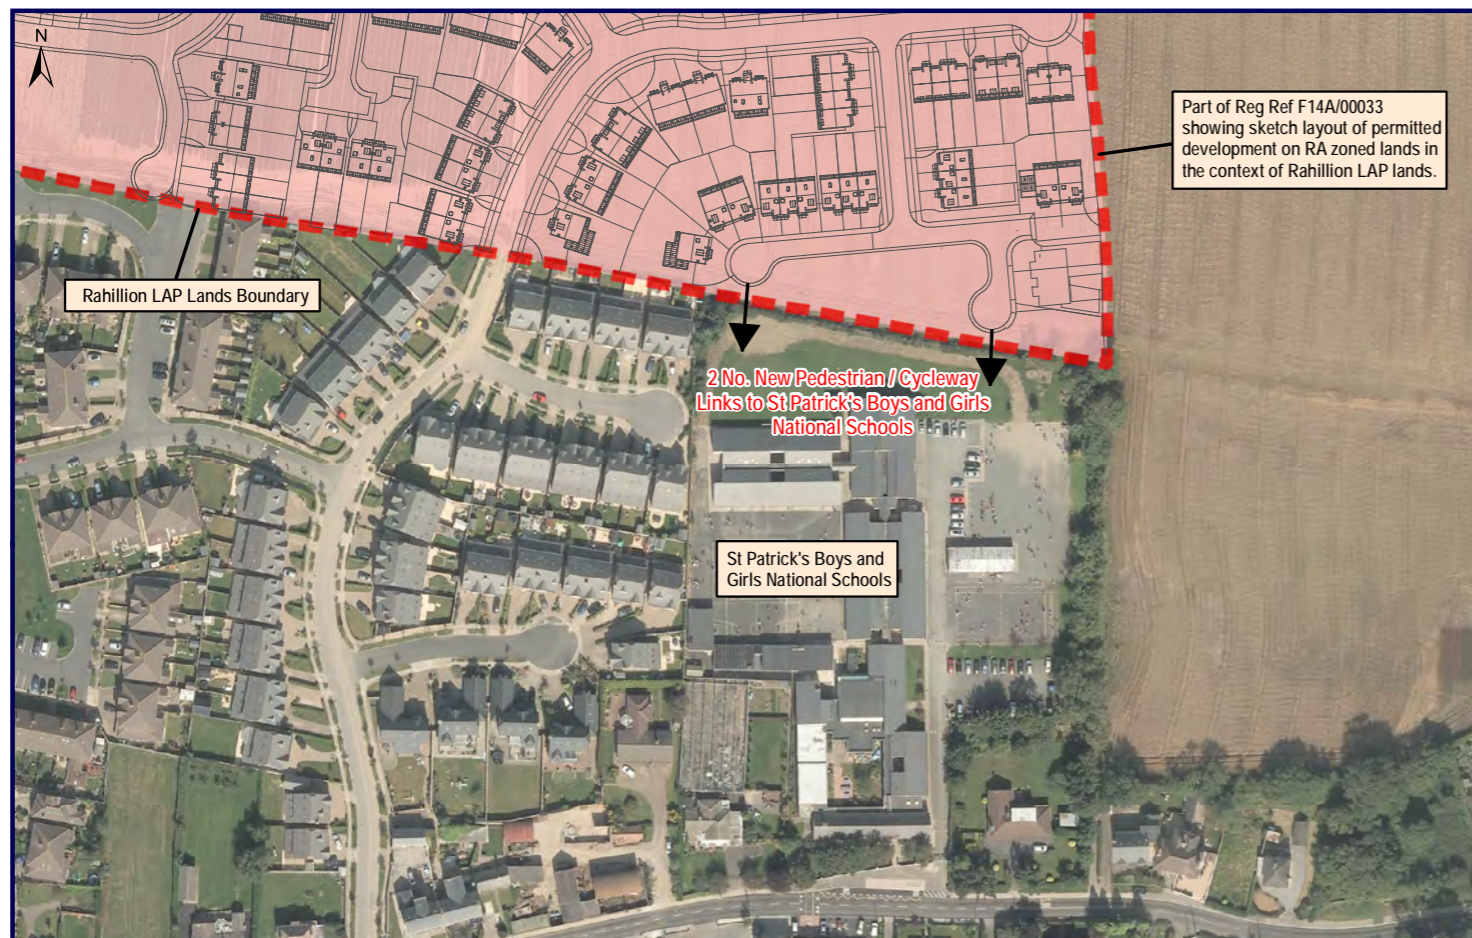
Extract from Drawing No. 1306.PL.01 lodged under Reg Ref: F14A/0033 showing the proposed footway / cycleway links to St Patrick’s Boys and Girls Schools
